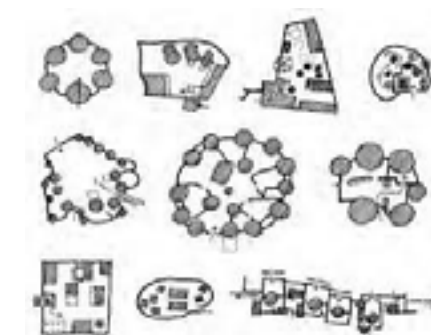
TYPICAL TRADITIONAL HAUSA HOUSE PLANS
